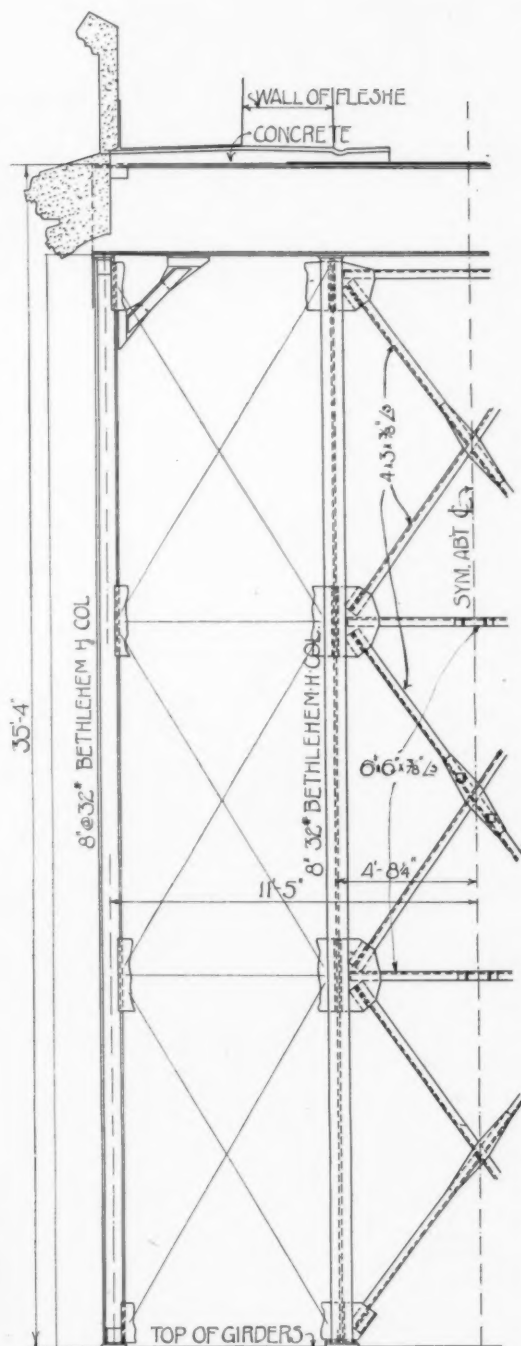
Elevation of lantern framework, showing the columns, diagonal bracing and girders A and B which support the fleche.
